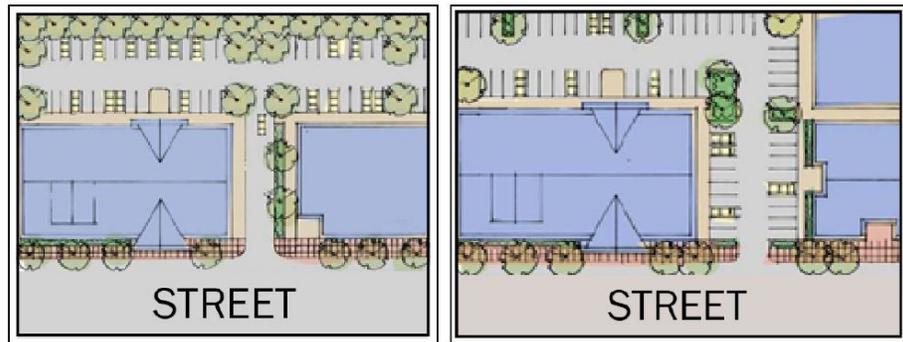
Allowable locations for off-street parking lots in the TC and TC-PD districts
